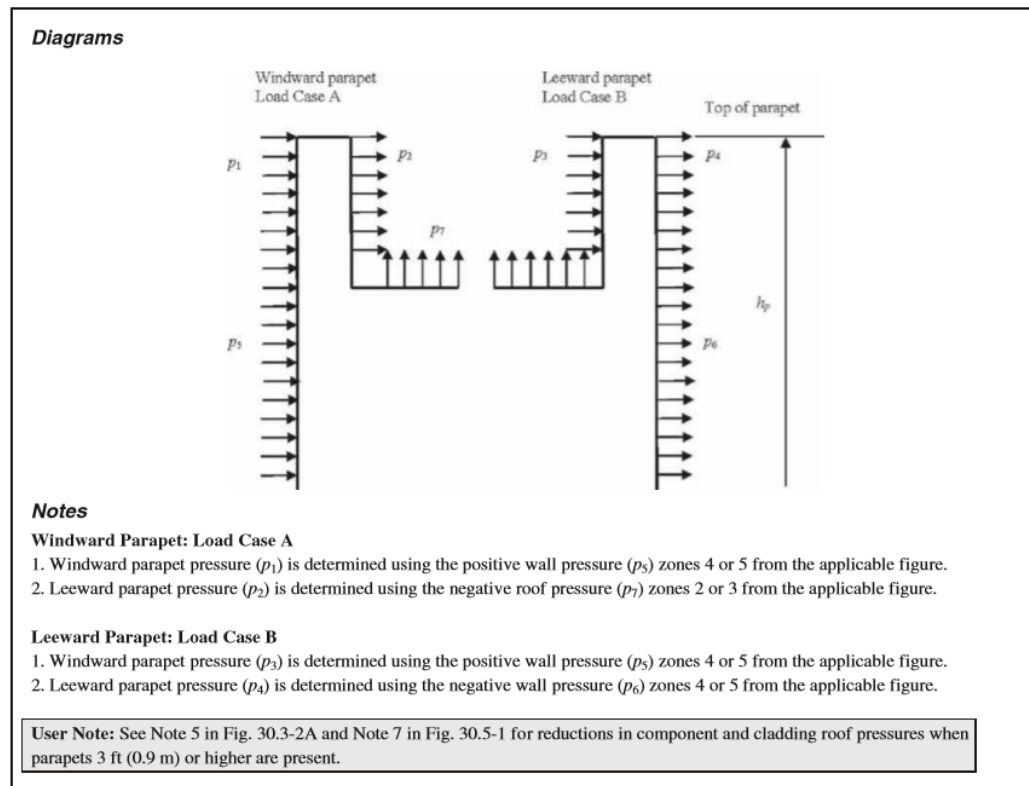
Components and Cladding, Part 6 (All Building Heights): Parapet Wind Loads, All Building Types—Parapet Wind Loads
